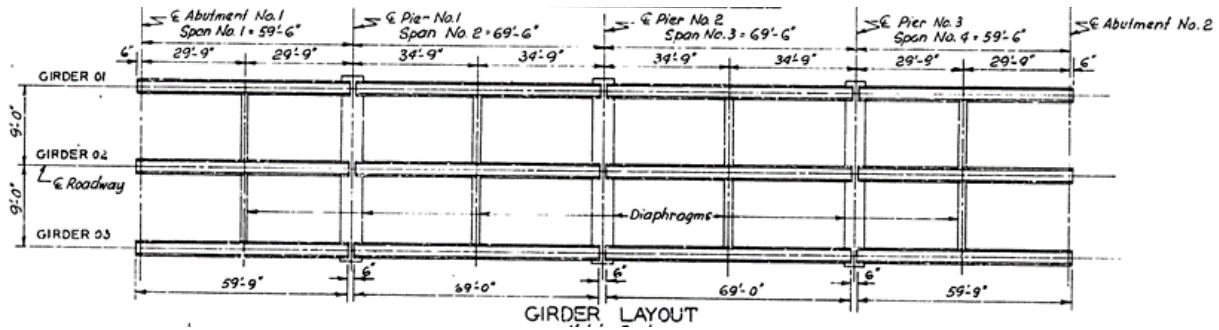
Plan view from the construction documents of York East bridge system, courtesy of NDOT
